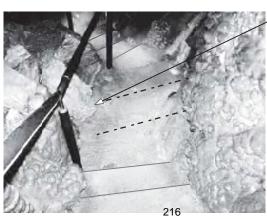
A SAWCUT TRAIL CROSSING BETWEEN STAIR 45 AND 46
